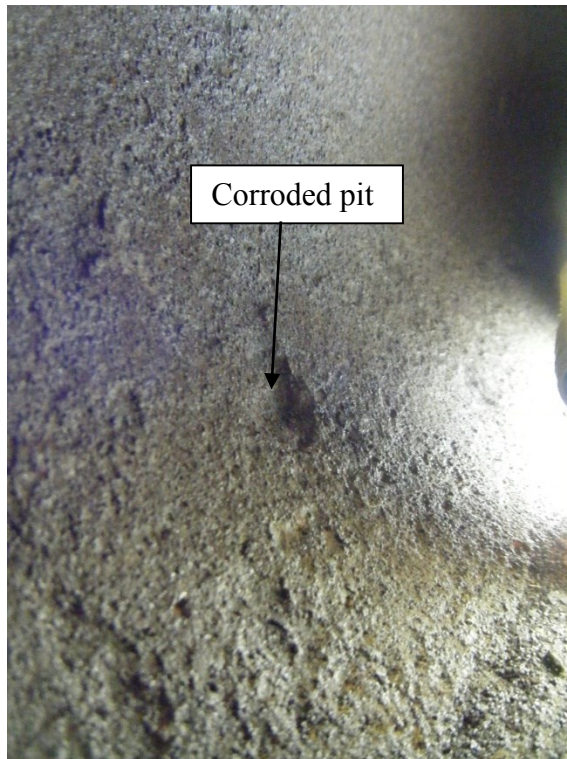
Specimen C2 corroded pit on north side in close proximity to strain gauge.
